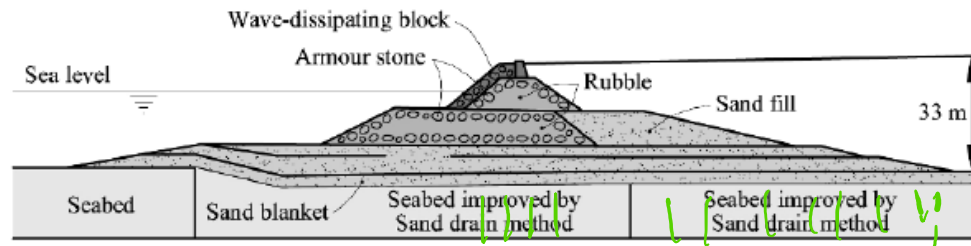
The cross-section of a seawall (after KALD, 2009).
